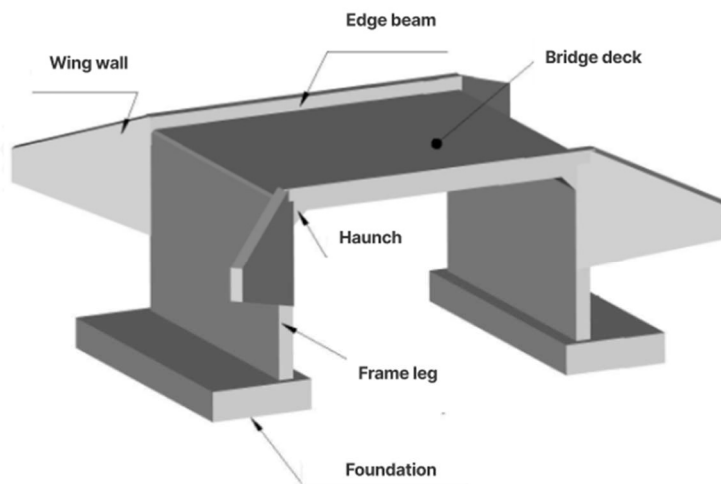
Different parts of a single-span slab frame bridge based on (BaTMan, 2020).
